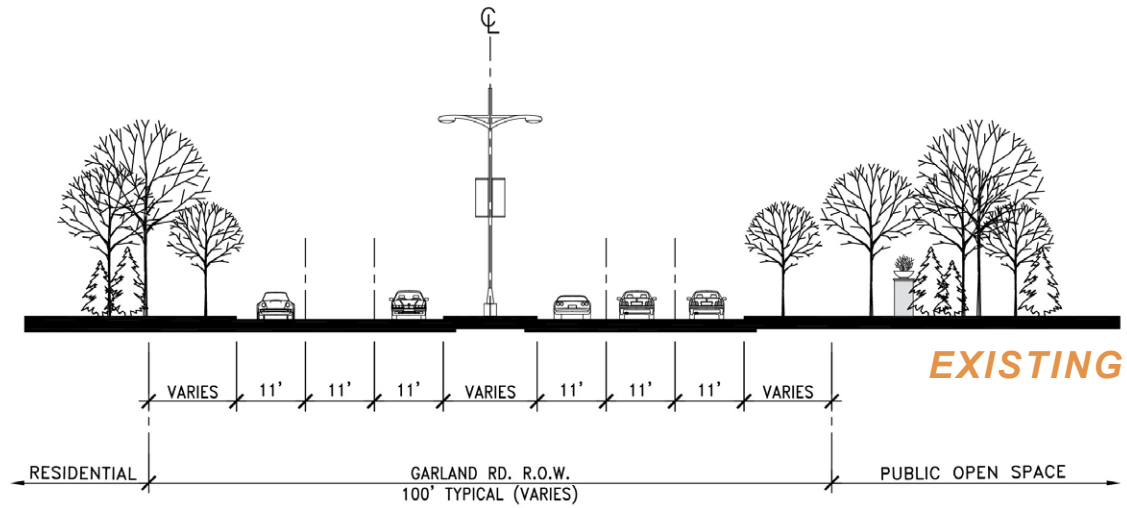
Section C: Garland Road and Buckner Boulevard
